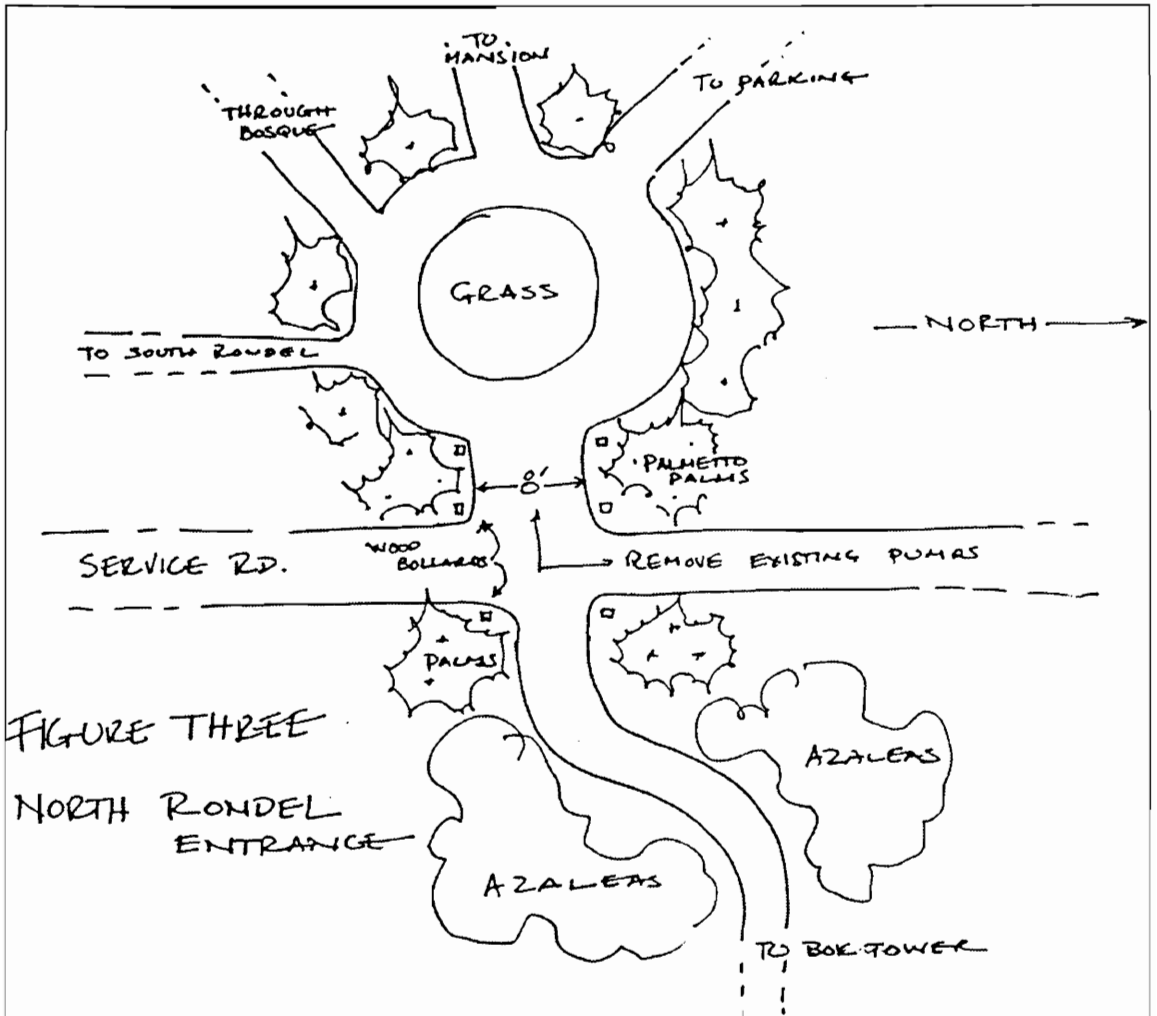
Connection to Bok Tower Gardens Designed by Rudy Favretti
